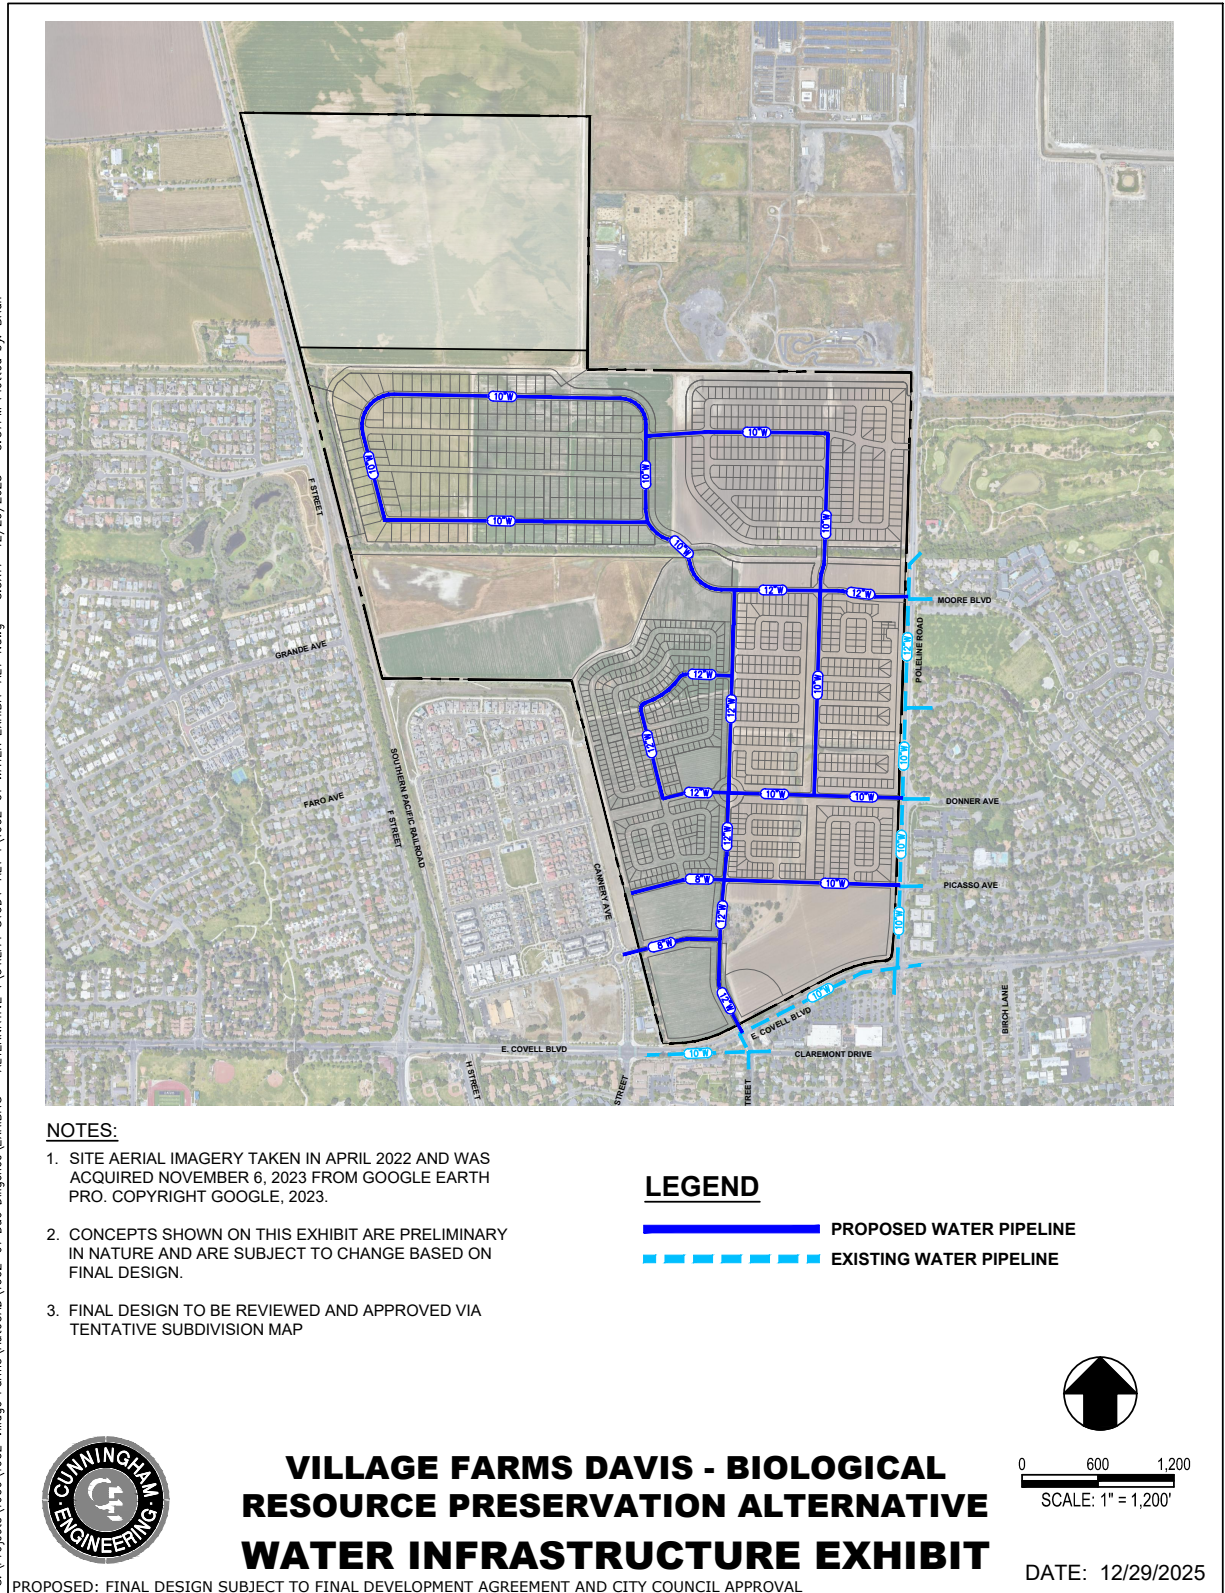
attached identifies the potential water infrastructure layout for the proposed Village Farms Davis project. The preliminary water infrastructure onsite is estimated at 8", 10", and 12" pipes to serve the development. A future study will need to be conducted to further refine the proposed pipe sizes throughout the development in order to meet the domestic demands and the fire flow demands. The triggers for the proposed infrastructure will also be defined in this future study to confirm adequate flow can be provided with each phase of the development.
